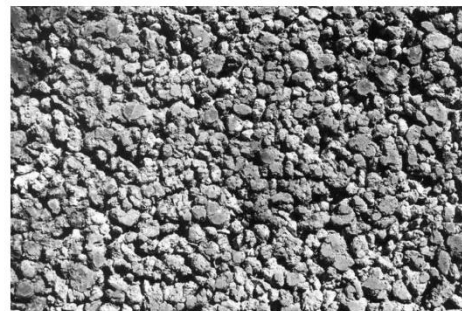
Pervious concrete pavement texture on parking lot.
